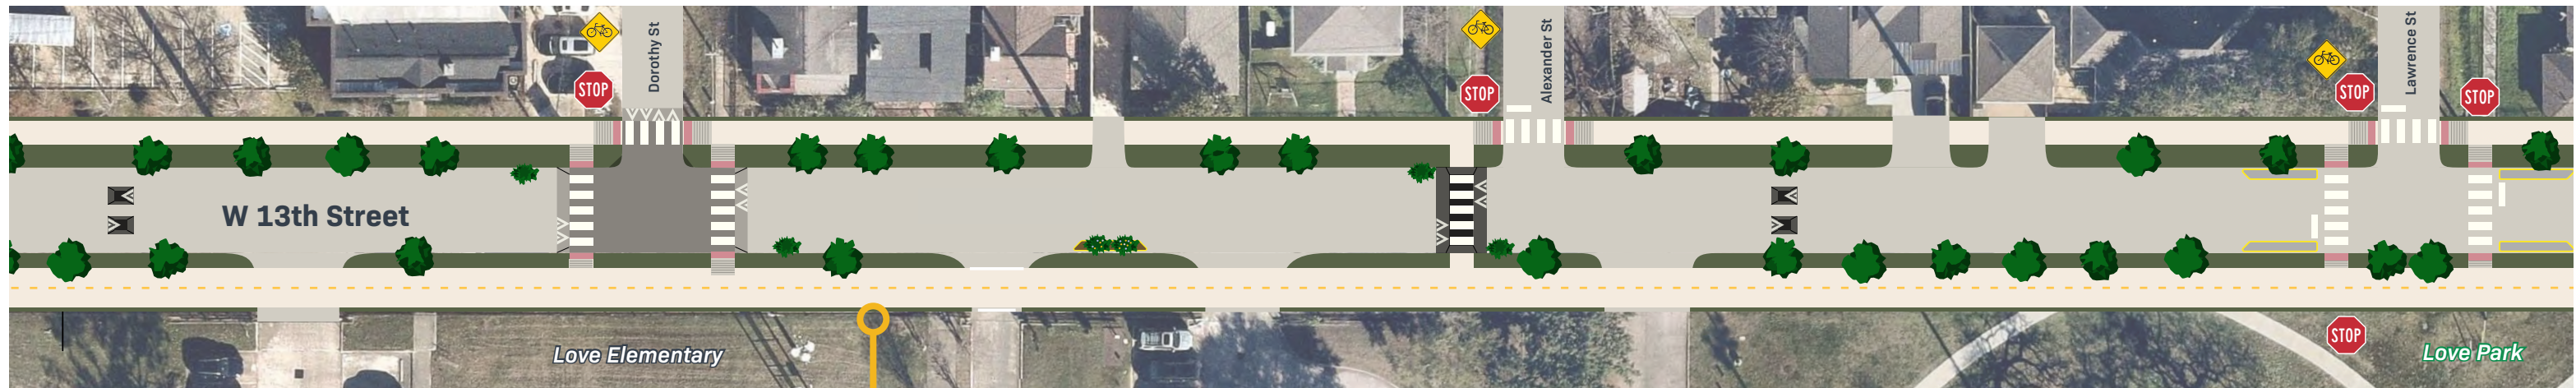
Heights School Streets Example Street (Source: Team Analysis, 2026)
